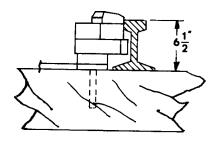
INCORRECT - Wheel Crowder Put In Track Wrong, Wheel Crowder Size 6 on 6-1/2" Rail. Too Low For Rail. Wheel Can Damage Crowder.
